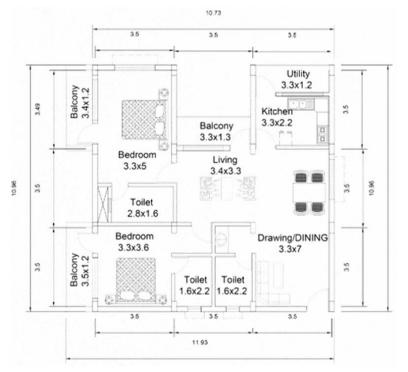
Typical floor plan of 2 BHK (1 unit)
